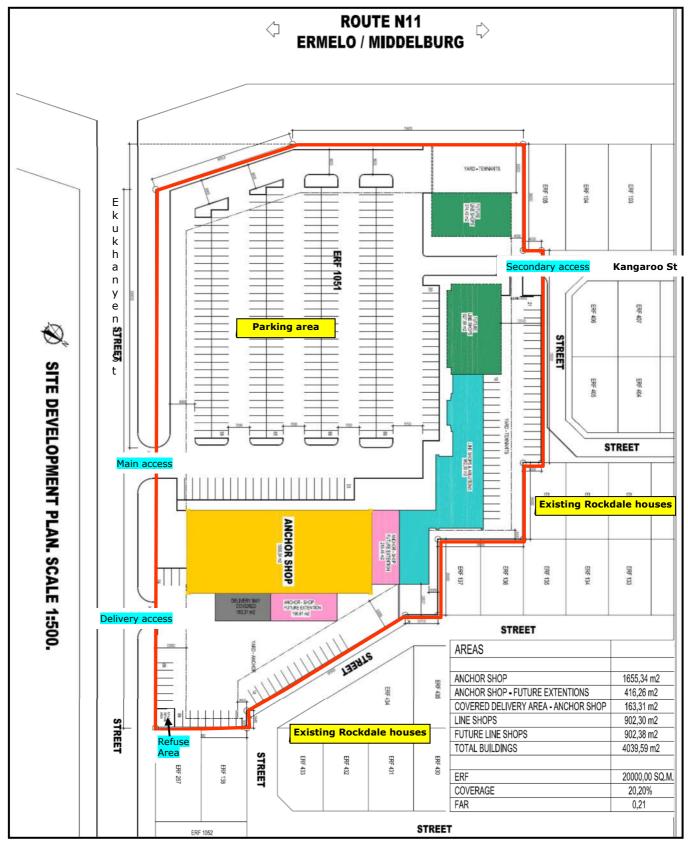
Proposed Site Development Plan (drafted by JSV Architecture, 2019)
